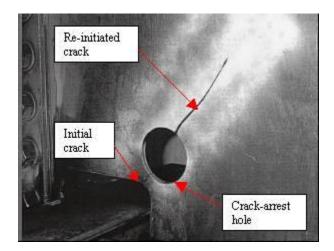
Fatigue Crack Re-Initiating through Stop Crack Hole (Dexter 2004)
